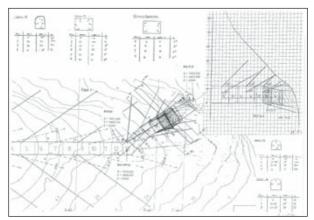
Plan for probe drilling and route towards the breakthrough point. Revised.
